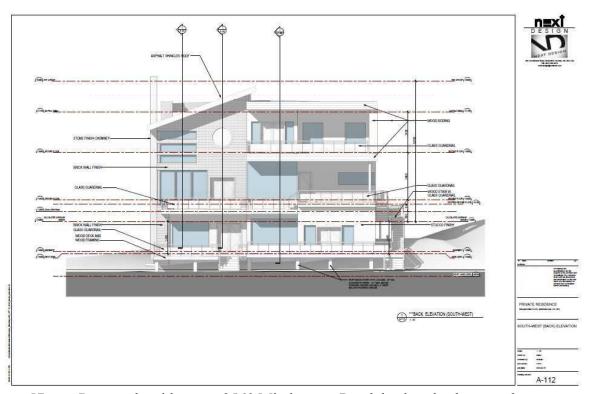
Proposed residence at 2560 Mindemoya Road, back or back or southwest elevation. (Image from Next Design Group, April 2018.)
